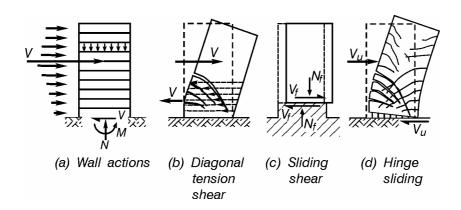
Undesirable modes of behaviour for seismically loaded cantilever structural walls in the post-elastic range [Park et al (1975, 1997)]
